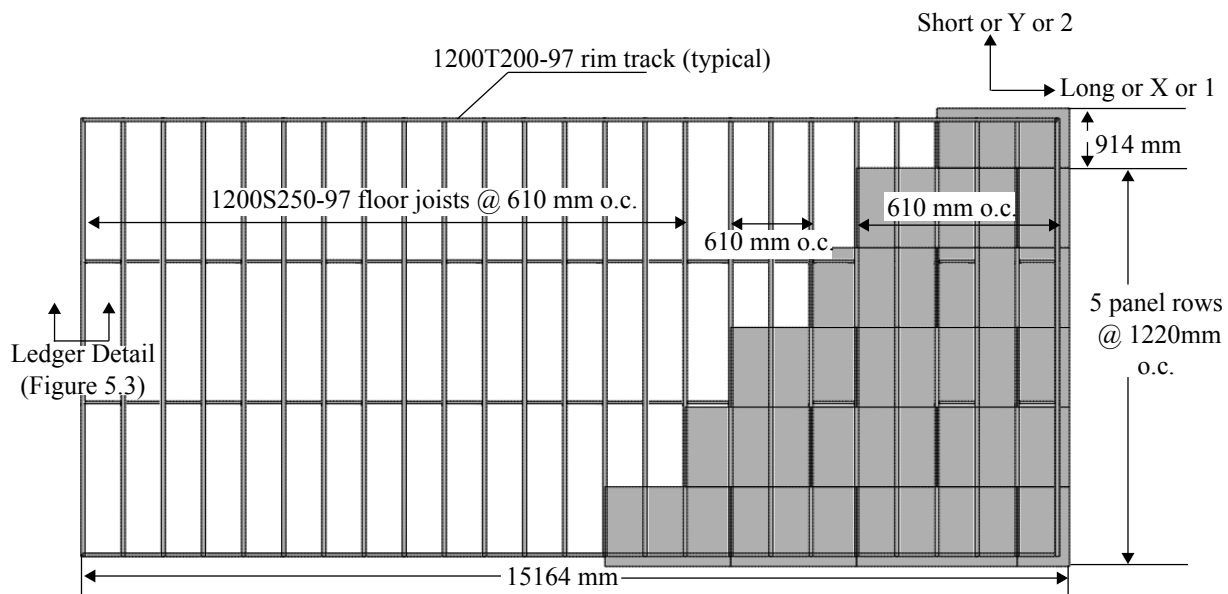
Plan view of structural system showing panel layout, floor joists, edge tracks, and edge supports that represent the lateral force resisting systems (gravity and shear walls)
